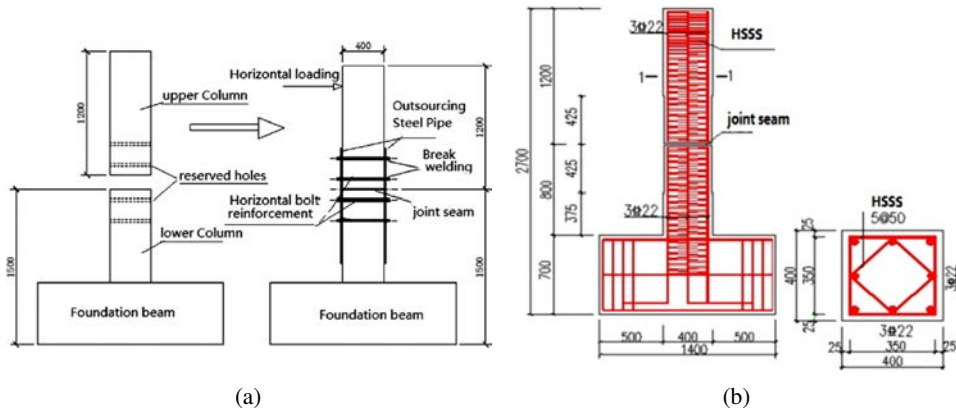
The size in mm of the prefabricated specimens Y01, Y02: (a) the assembly of columns, (b) the reinforcement of columns
